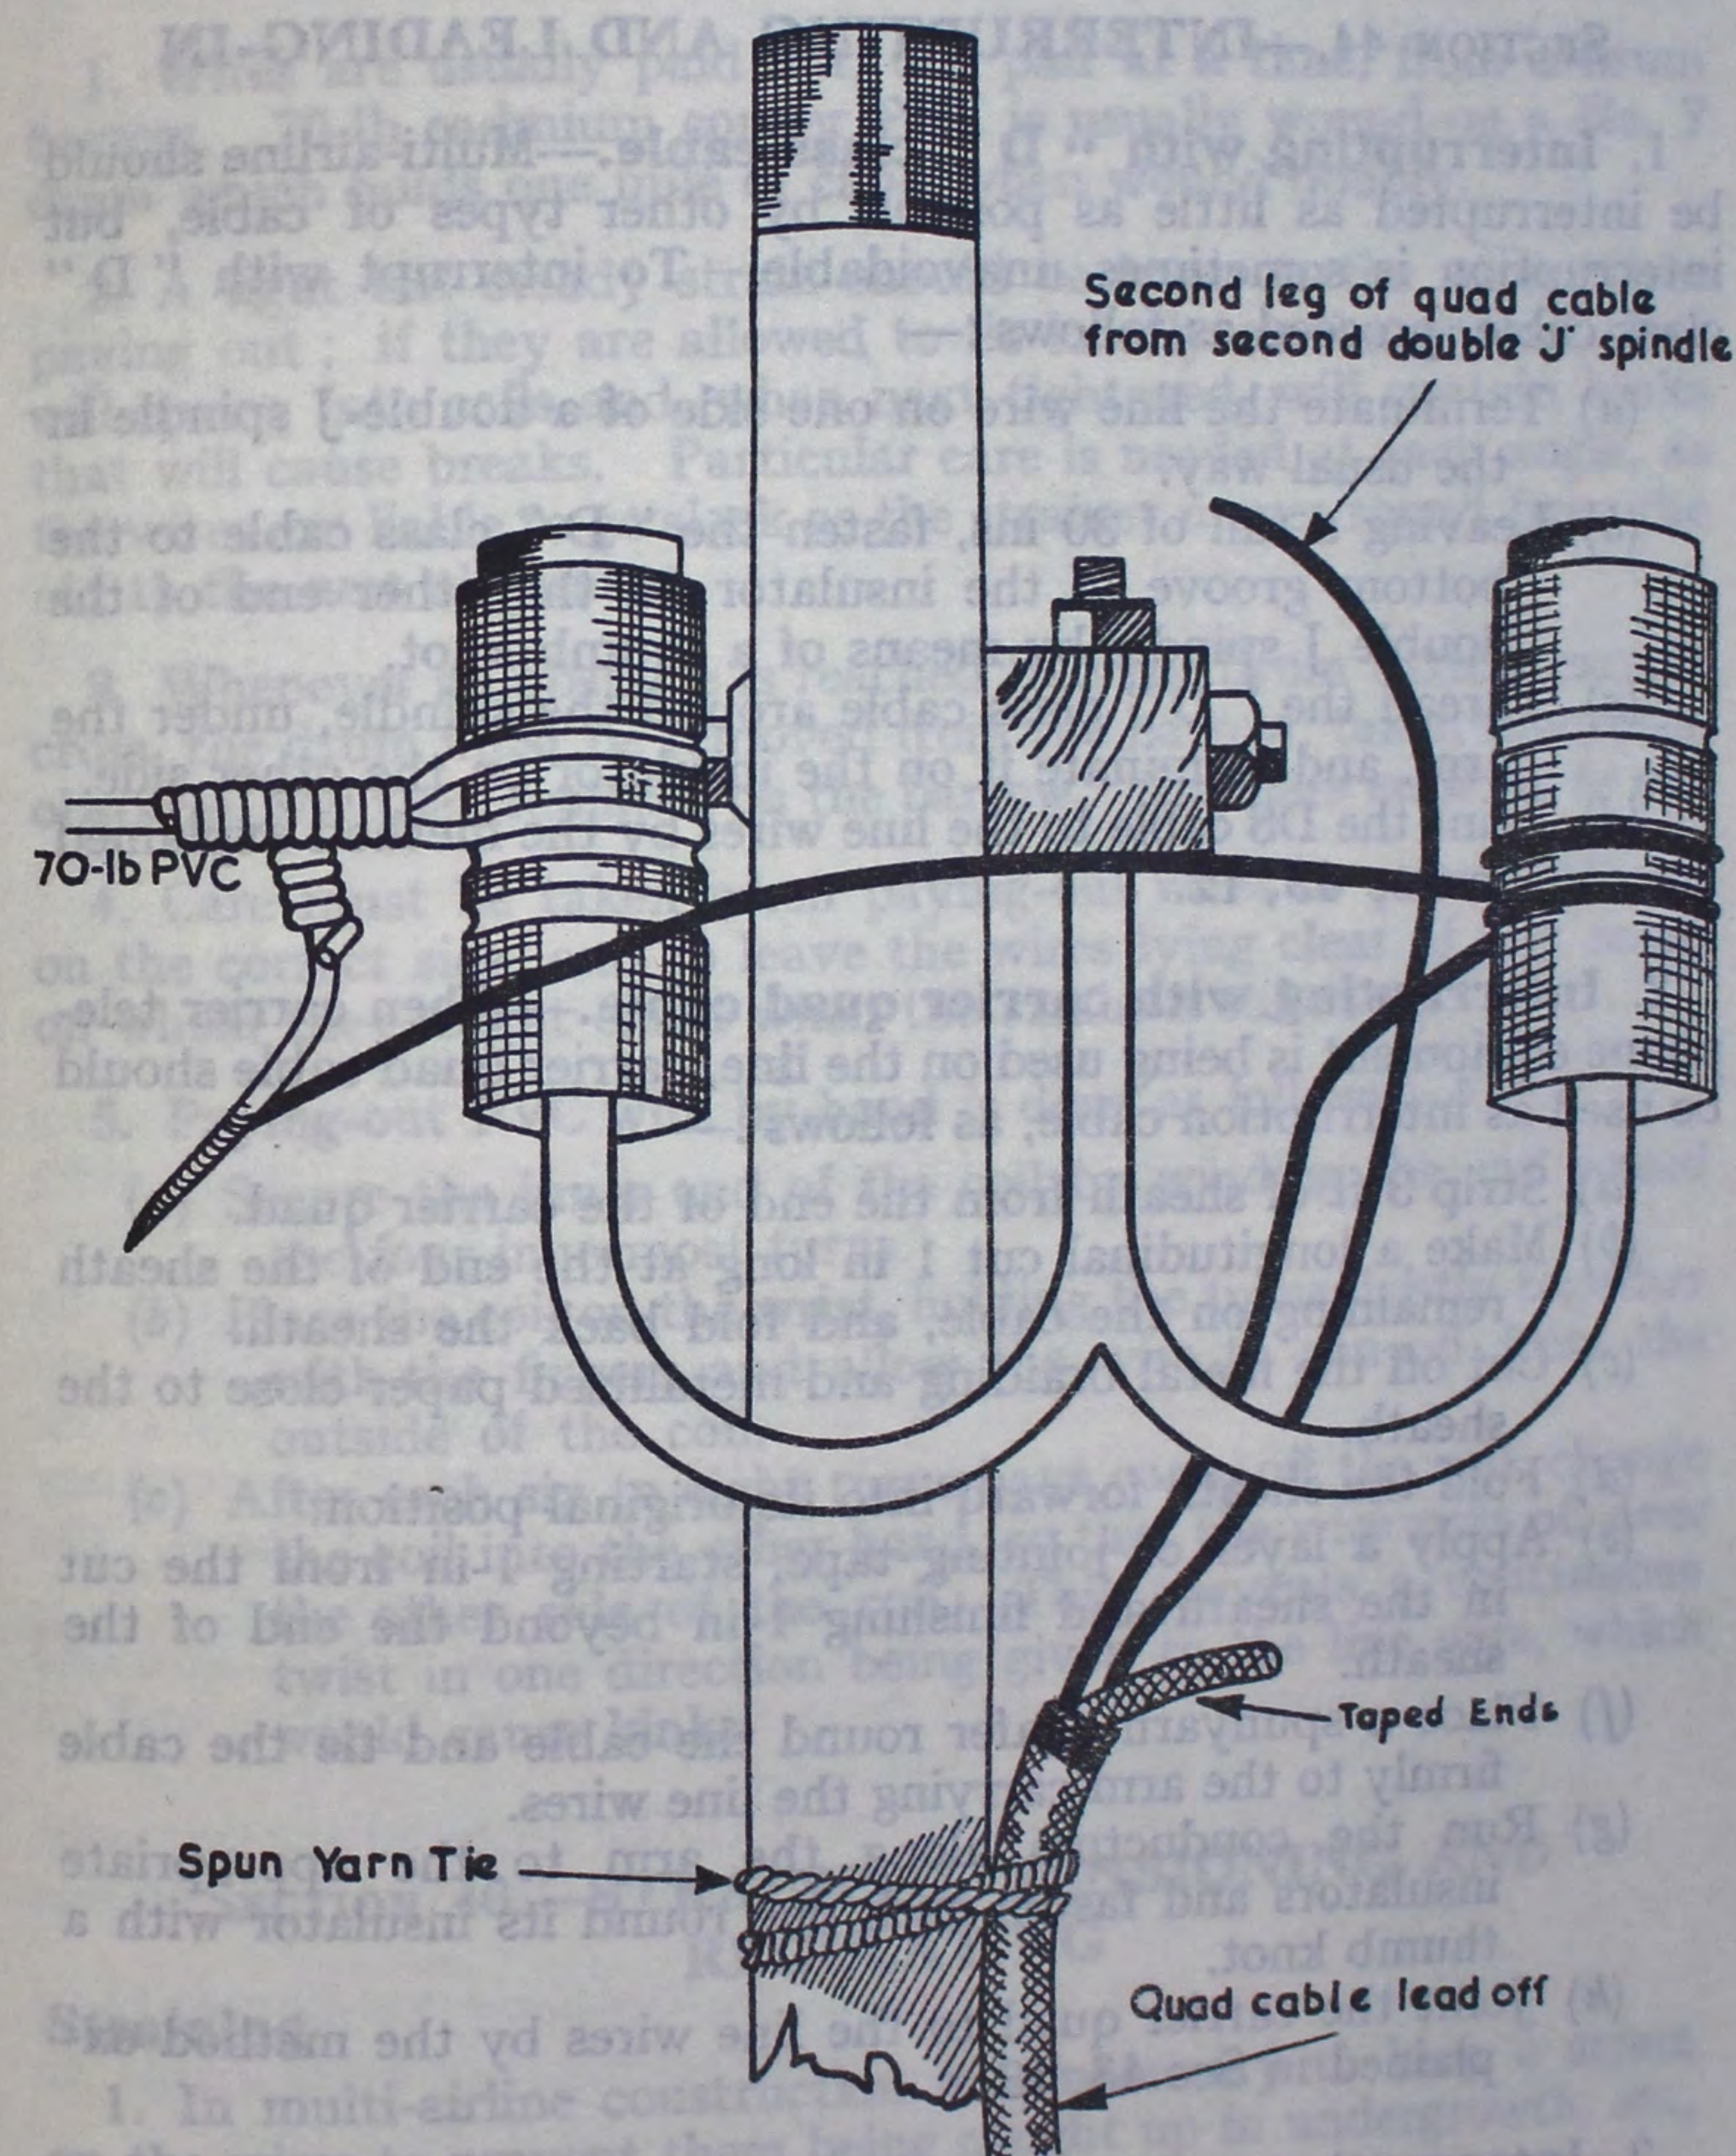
Jointing 70-lb cadmium copper PVC to quad cable.
